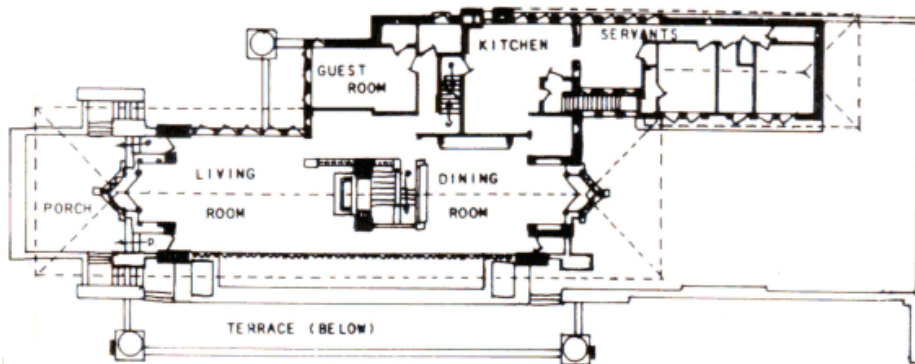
Floor plan of the Robie house's first floor (Source: <http://www.delmars.com/wright/flw8-5.htm>, Copyright: Frank Lloyd Wright Foundation)
